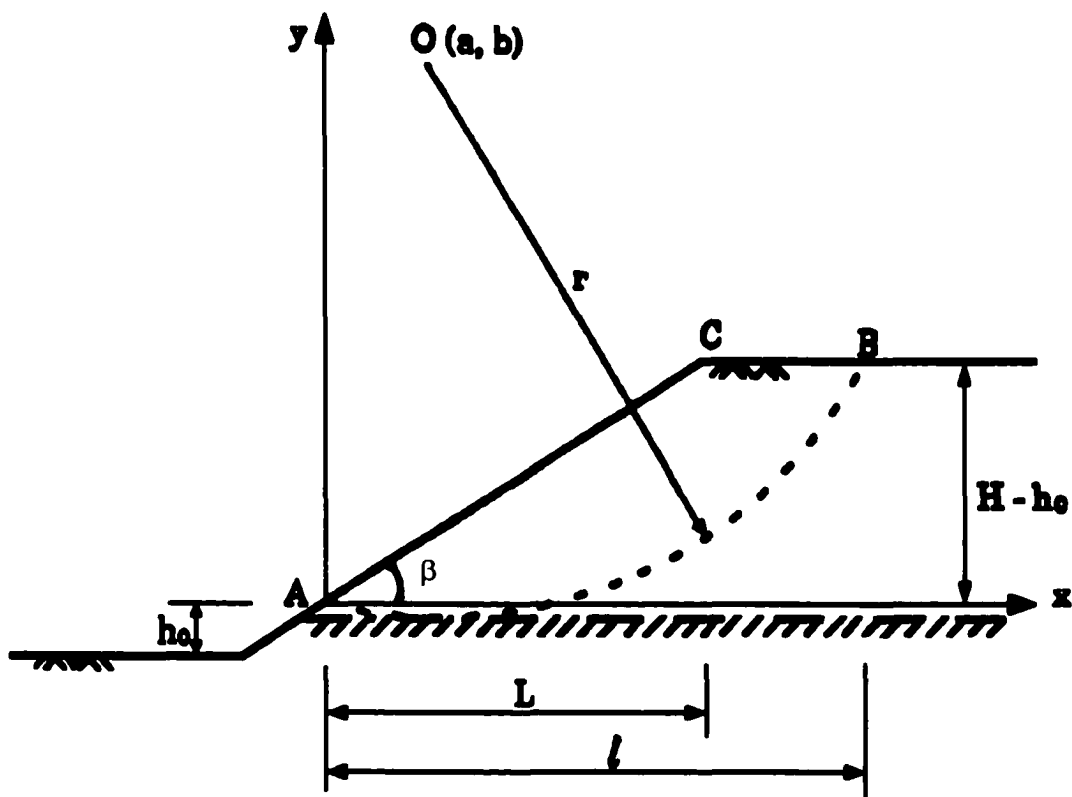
Typical Section for Face Failure Slope (Cao and Zaman, 1999)
